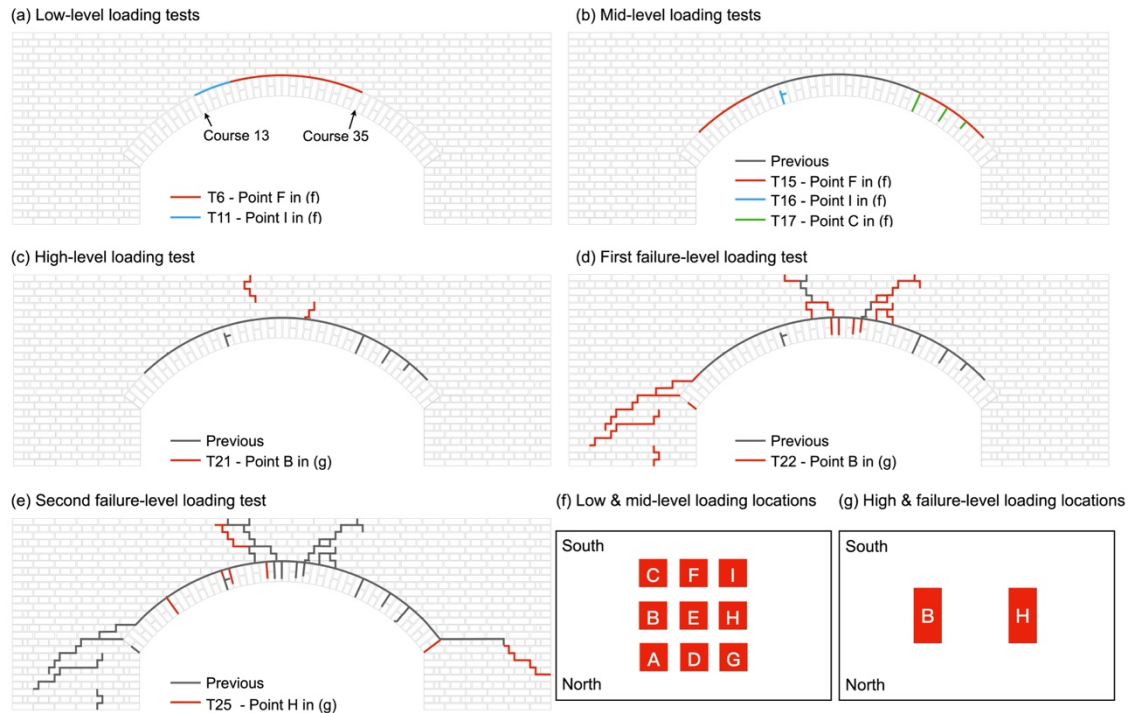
Crack propagation of the south-side spandrel wall at: (a) low loading level tests; (b) medium loading level tests; (c) high loading level test; (d) and (e) the first and second failure loading level tests; (f) and (g) show the loading locations at the low- and mid-level, as well as the high and failure level, respectively.
